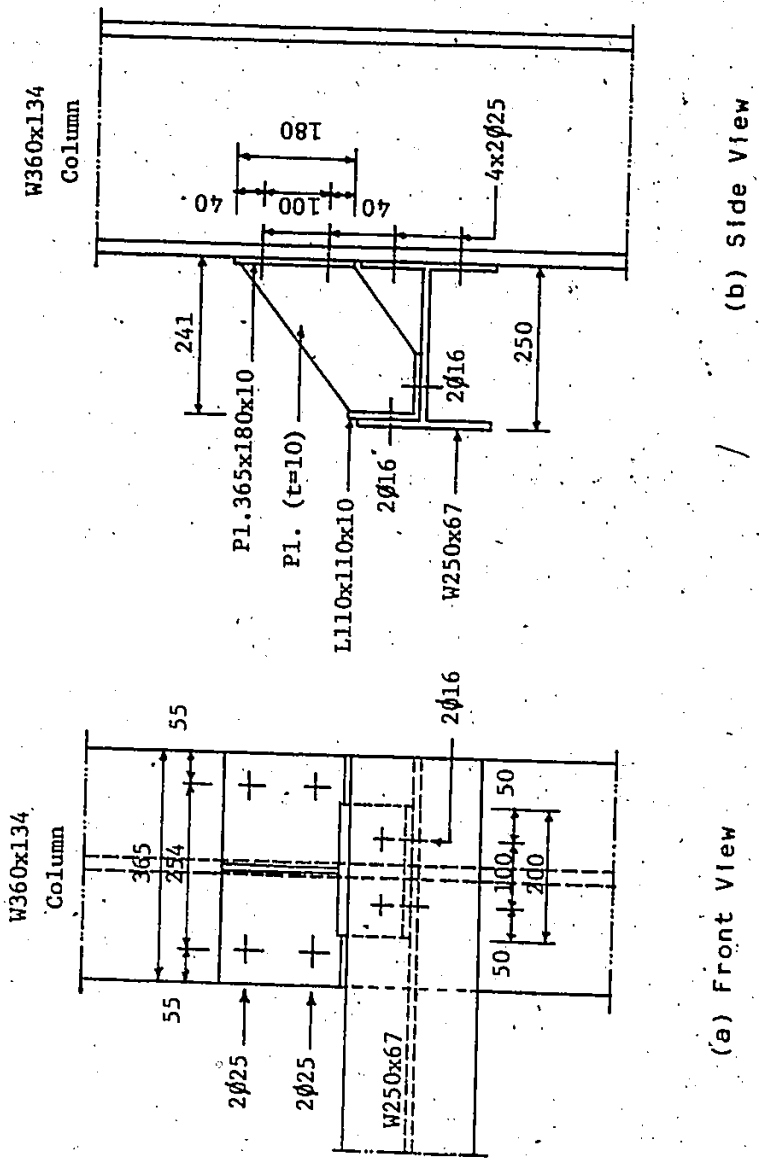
Details of Bracket Connecting Bottom Beam to W360x134 Column
